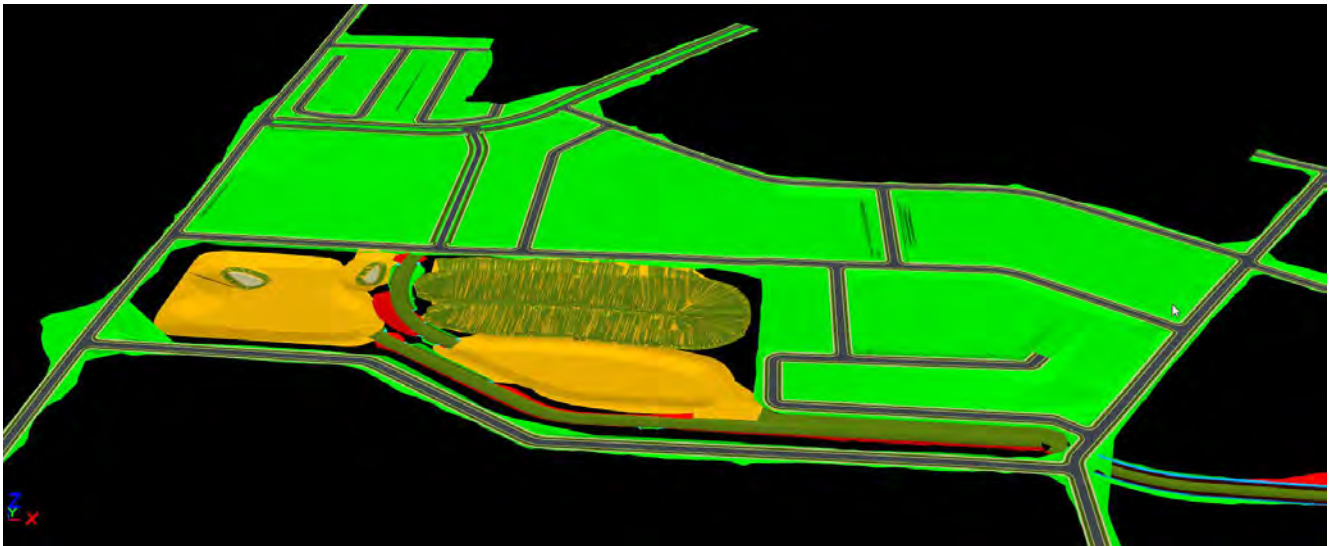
Image showing potential road grading north of Craig Road wetland (Verve Projects)
